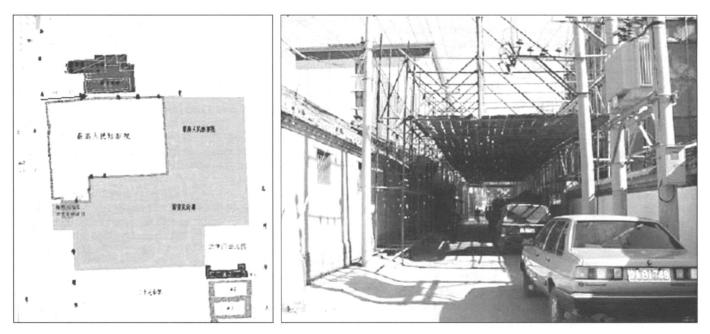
Beijing – The traditional features of historical and cultural preservation areas are disappearing: The on-going expansion project of the Supreme People's Procuratorate main office building. The new building project demolished all the old buildings and replaced them with modern constructions that do not match the traditional style of the area. The project destroys the traditional hutong-courtyard space configuration with a continuous history starting from the Ming Dynasty.
